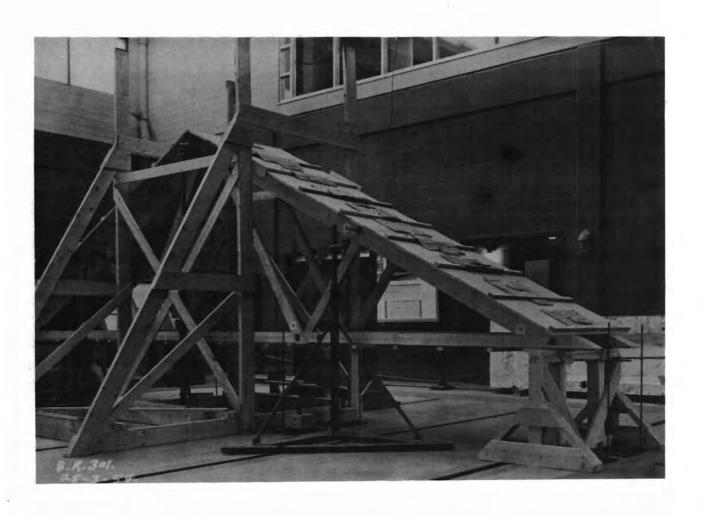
Test assembly with ceiling load and dead load applied. Trusses free to deflect independently of stabilizing framework.
